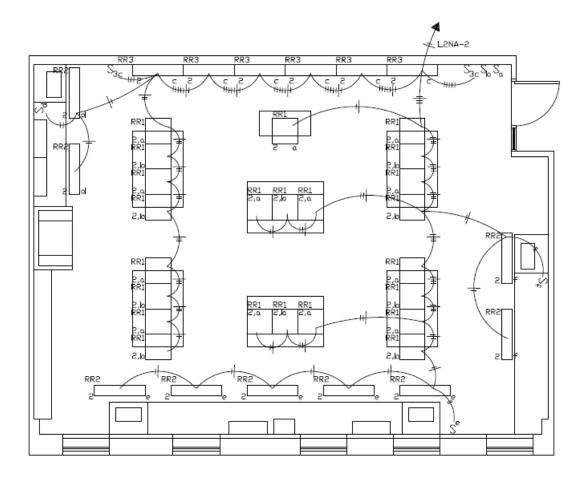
Second Floor Circuiting Plan – Ecology Teaching Lab
